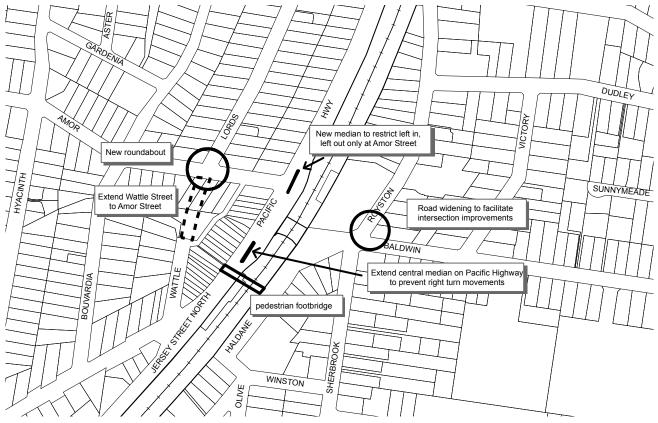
(I): Traffic Management Improvement Plan - Asquith.(C)
